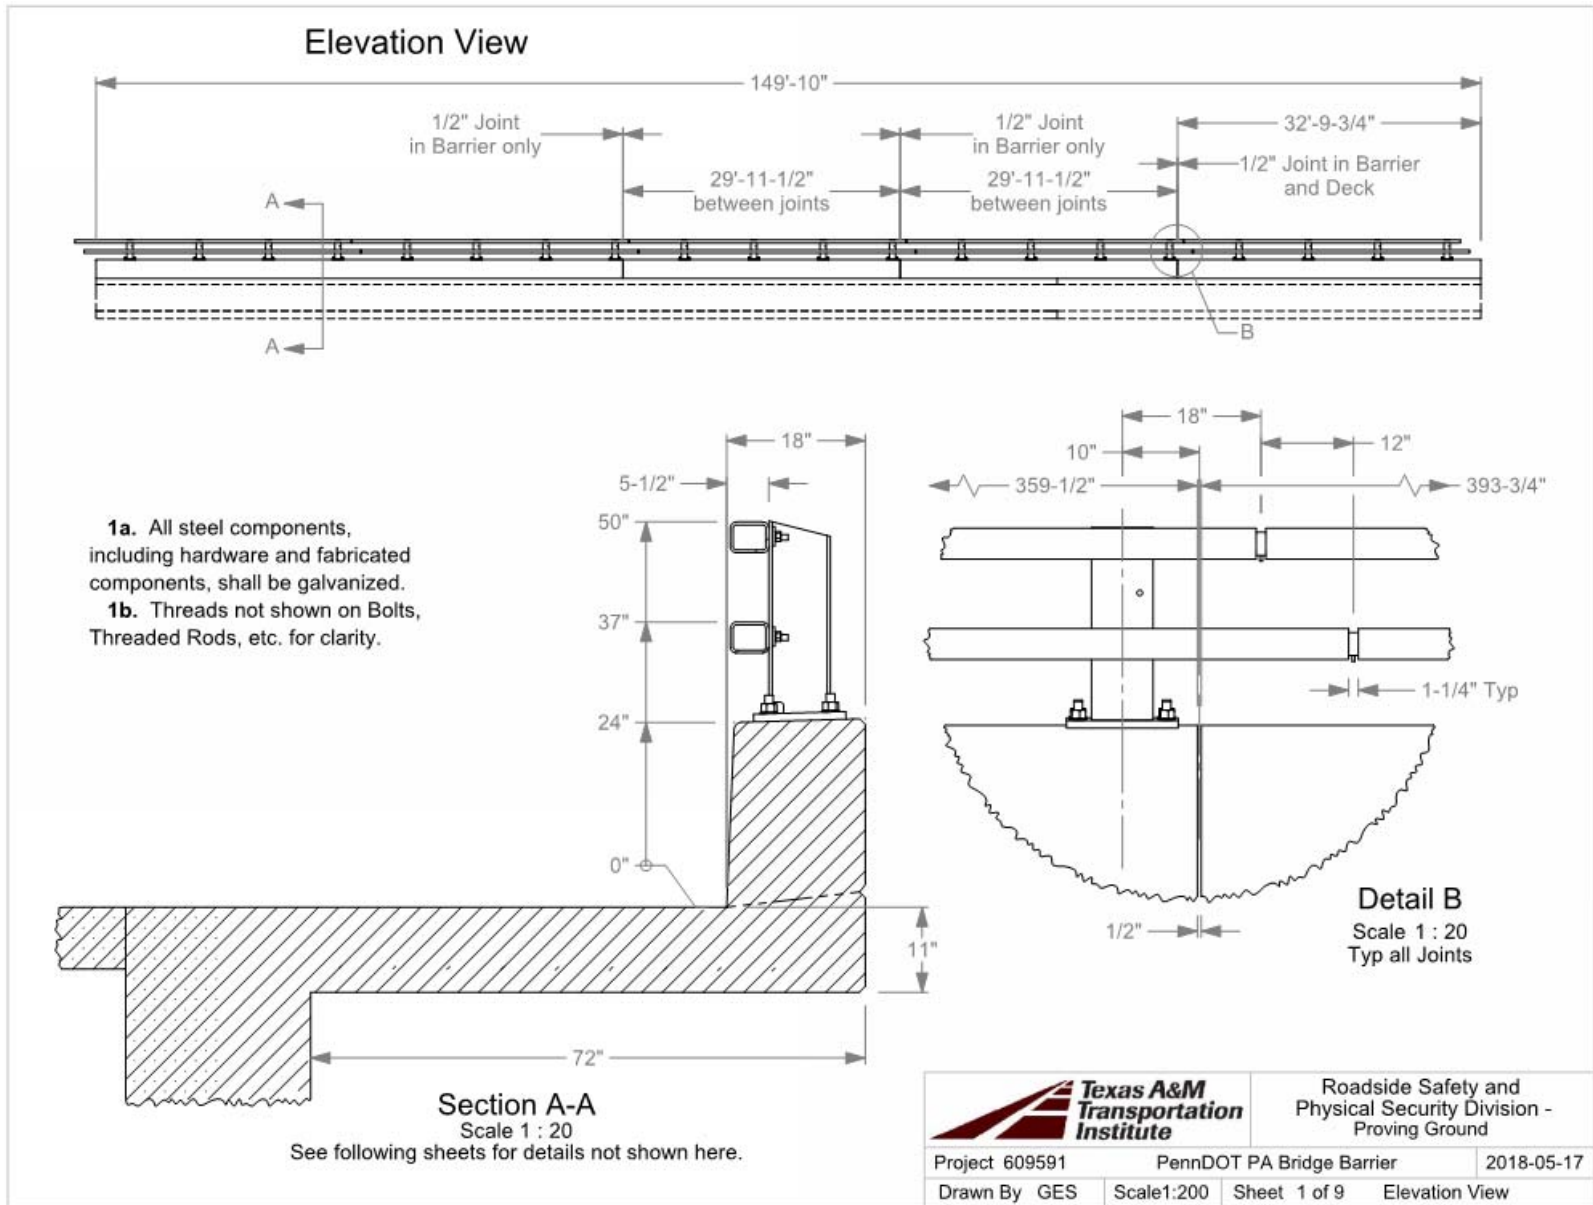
Details of the PennDOT PA Bridge Barrier.
